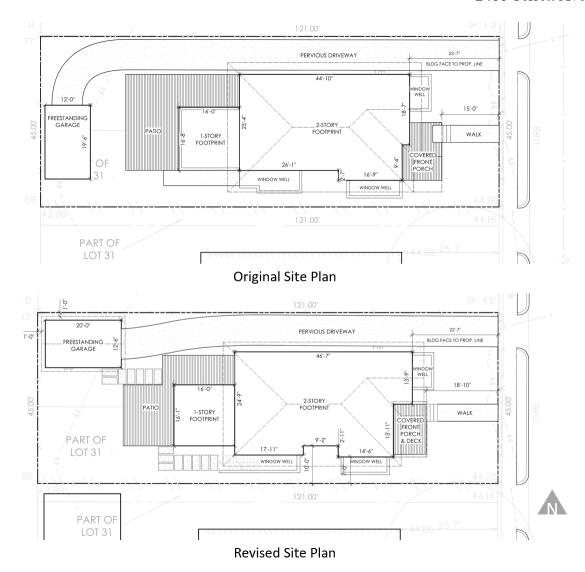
Original Site Plan Proposal (Top), Final Revised Site Plan Proposal, dated October 14 (Bottom)
